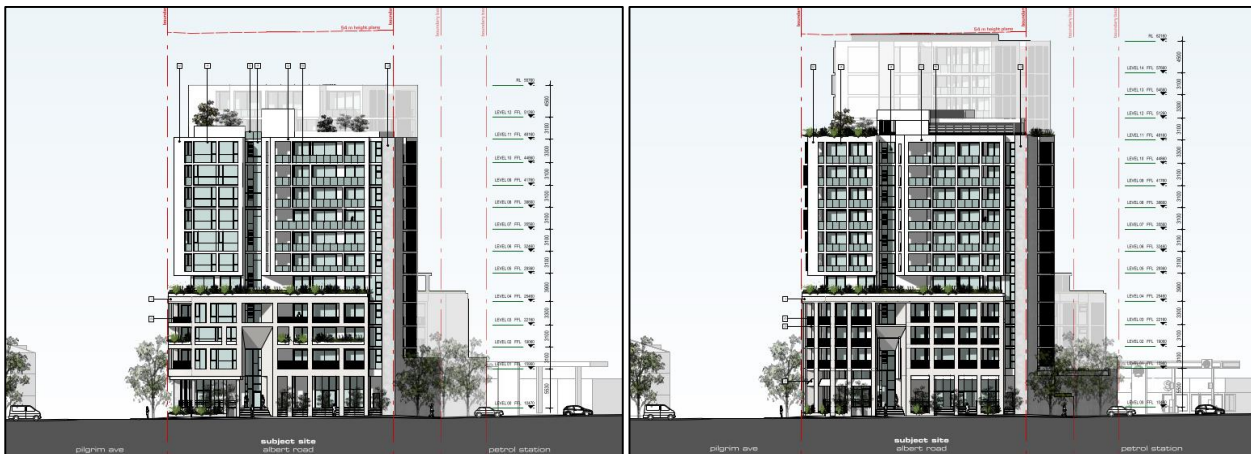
Comparison of the original and revised proposal (southern elevation)
